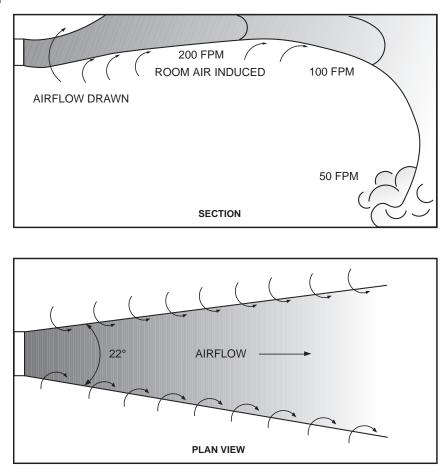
A Jet of Ventilating Air from a Wall Outlet a Few Inches Below the Ceiling.
